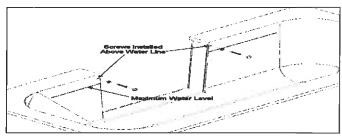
Interior Screws To Secure Side Filler Pieces
